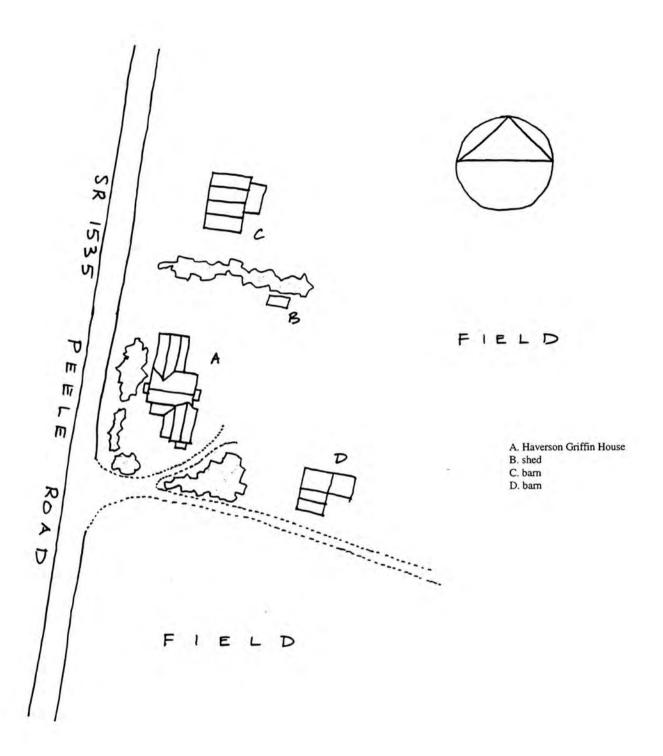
Haverson Griffin House Site Plan Not to Scale
